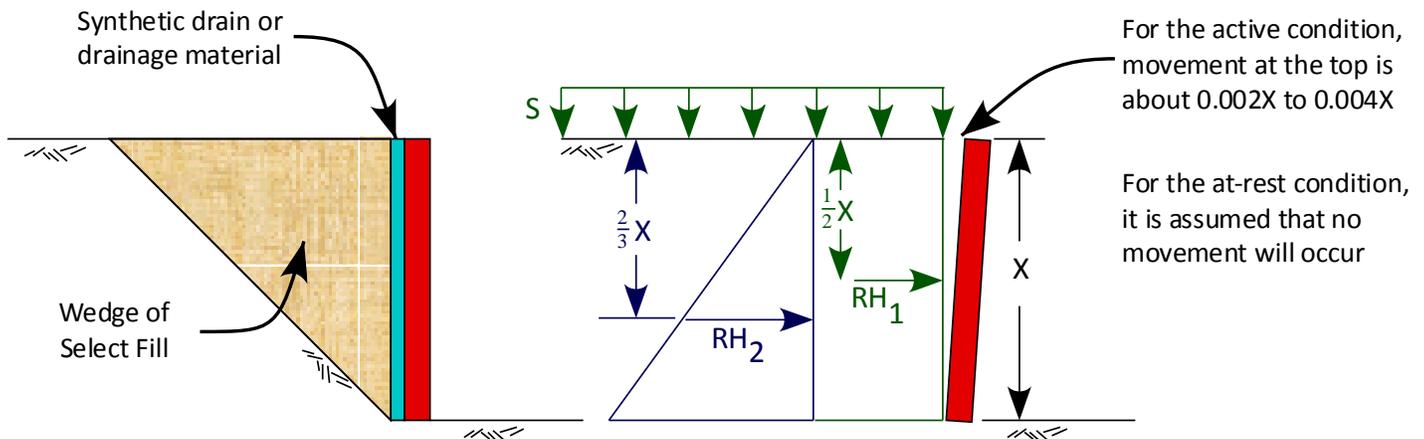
Sketch of Retaining Wall (not to scale, for illustrative purposes only)
